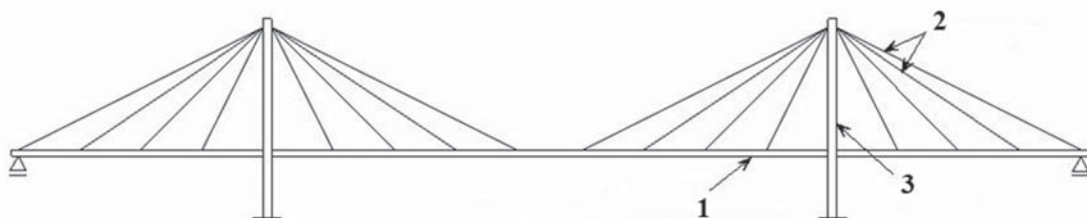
A typical design scheme of a cable-stayed suspension bridge: 1 – stiffening girder; 2 – cable stays; 3 – pylon
